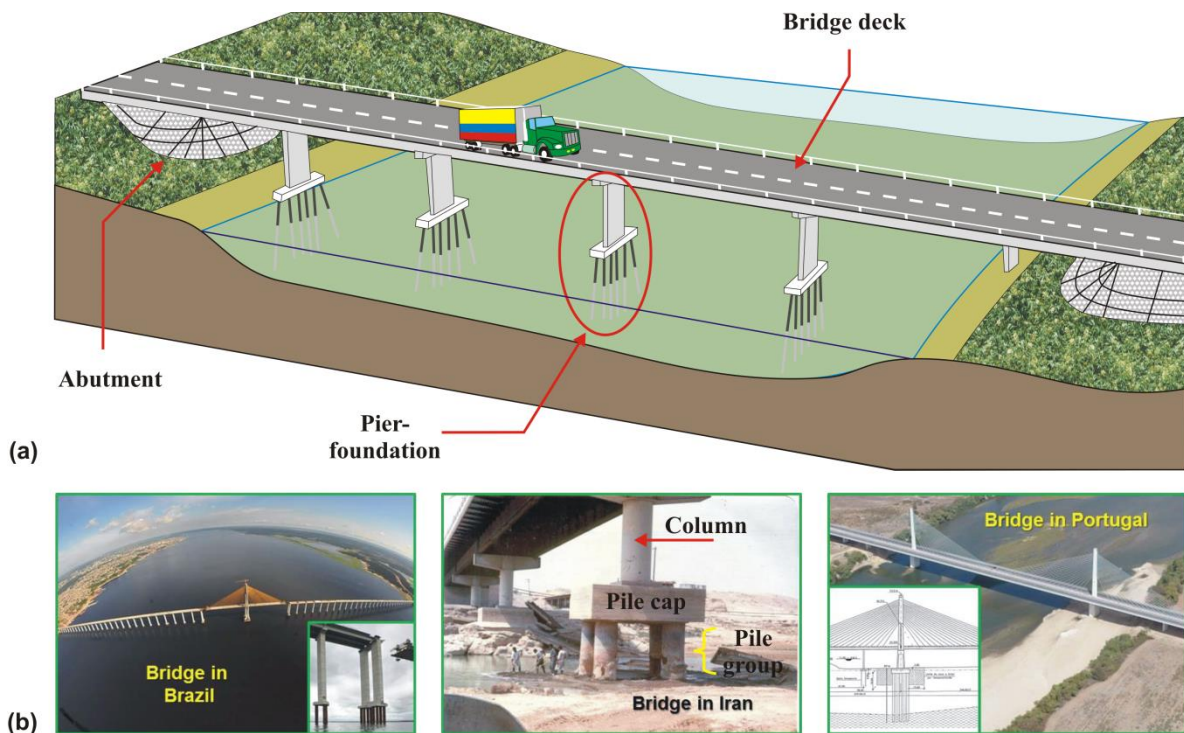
(a) scheme of basic bridge structure and (b) photographs of common complex piers
